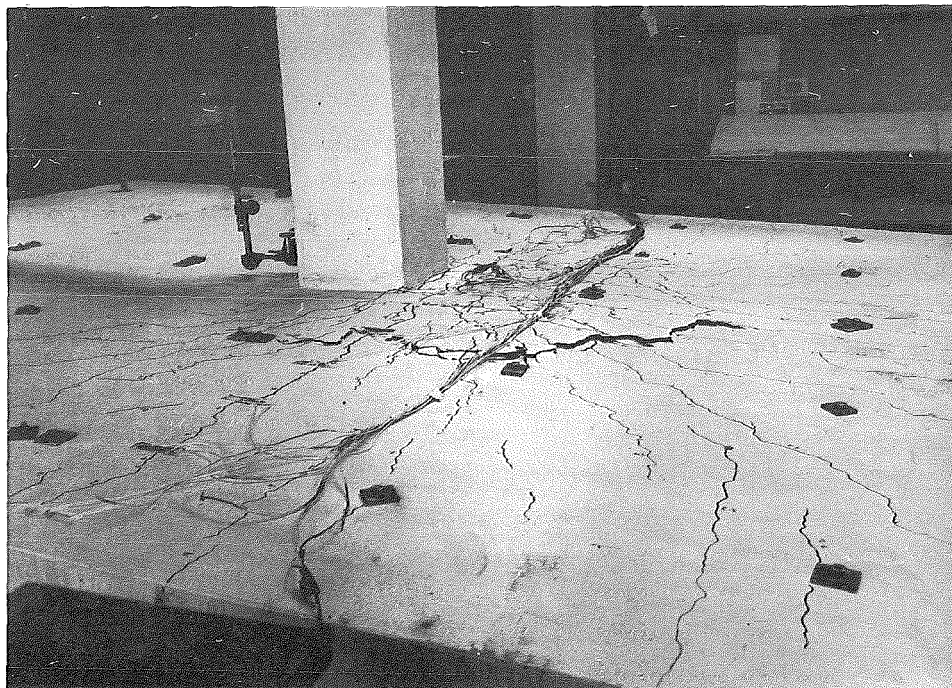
CRACK PATTERN OF SPECIMEN 4S
